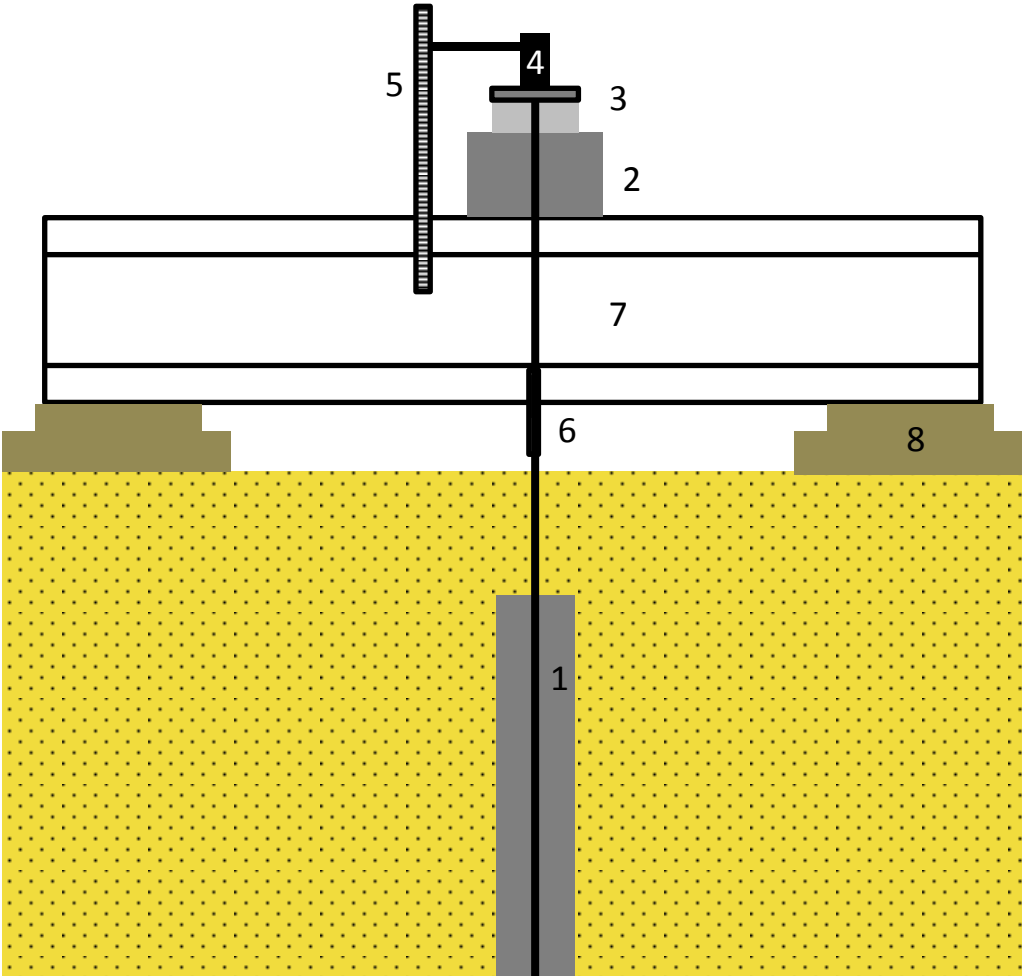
SCHEMATIC OVERVIEW PILE TESTING SET-UP
